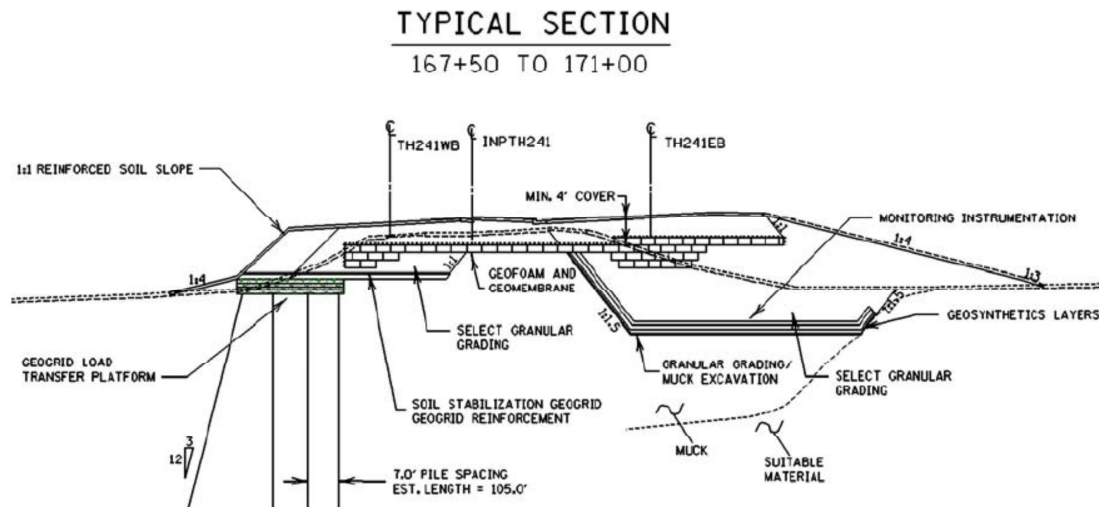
Cross section showing ground improvement beneath TH 241 from Wachman and Labuz (2008)
